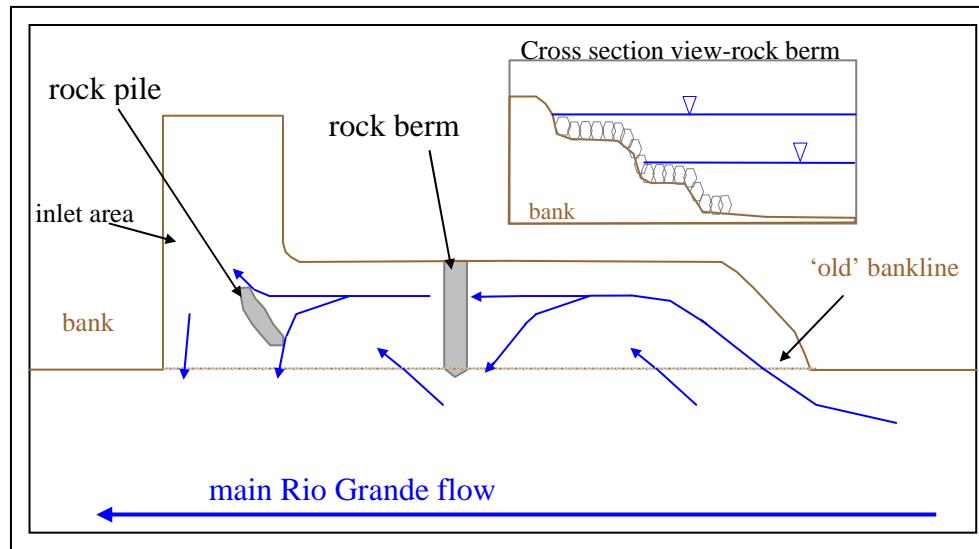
Planview sketch of initially constructed shelf/inlet area with initial flow patterns. Two shelf elevations are envisioned forming as indicated in the cross section view of the rock berm. The cross section view of the rock berm depicts a low water elevation and a high water elevation.
